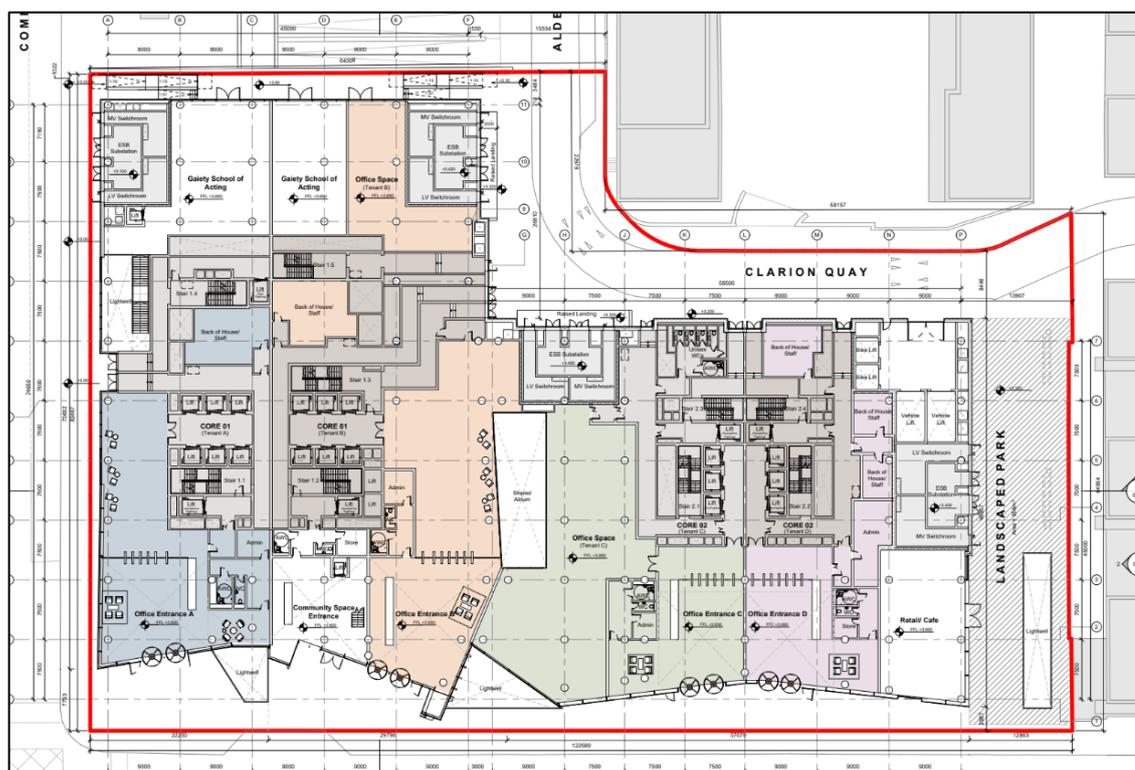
Ground floor plan for Option 2 (Source: HJL Architects, Drawing Ref. 1NWQ-HJL-AX-00-DR-A-0100)
